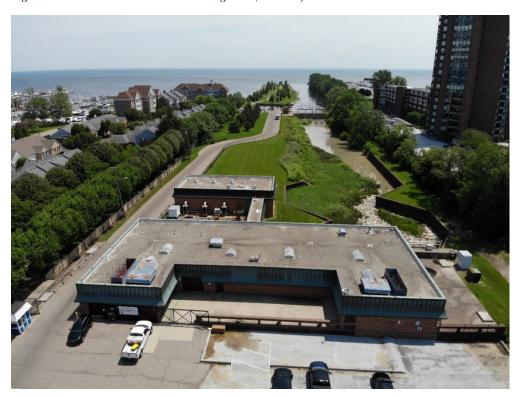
Drone Aerial at 100 FT Facing East (02/01/24)-Note future canal footprint on left
